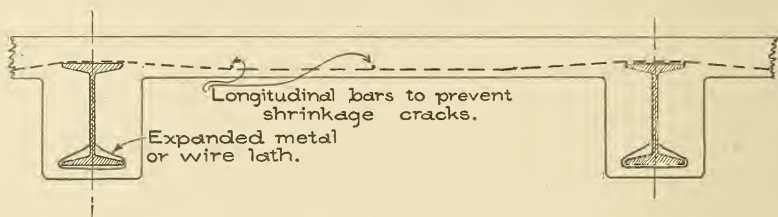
Concrete Floor-Slabs on I-Beam Girders.
